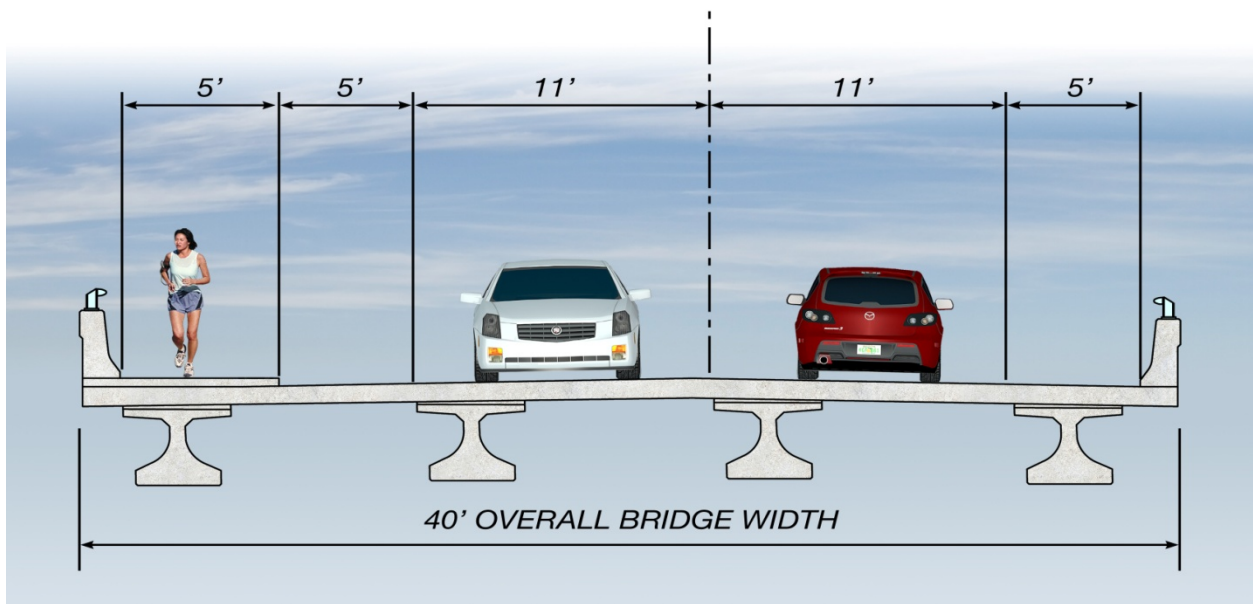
Proposed Roadway Section East of Proposed Movable Bridge
